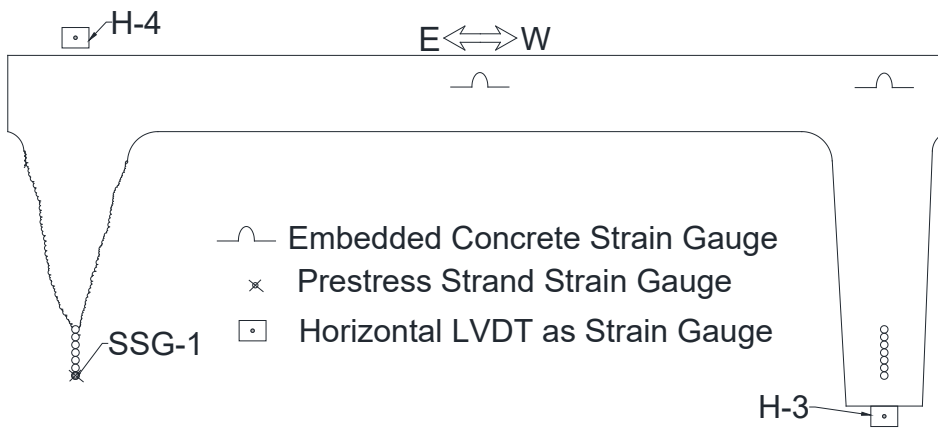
Strain Gauge Instrumentation Plan for 50-ft (15.24-m) Long Girder
